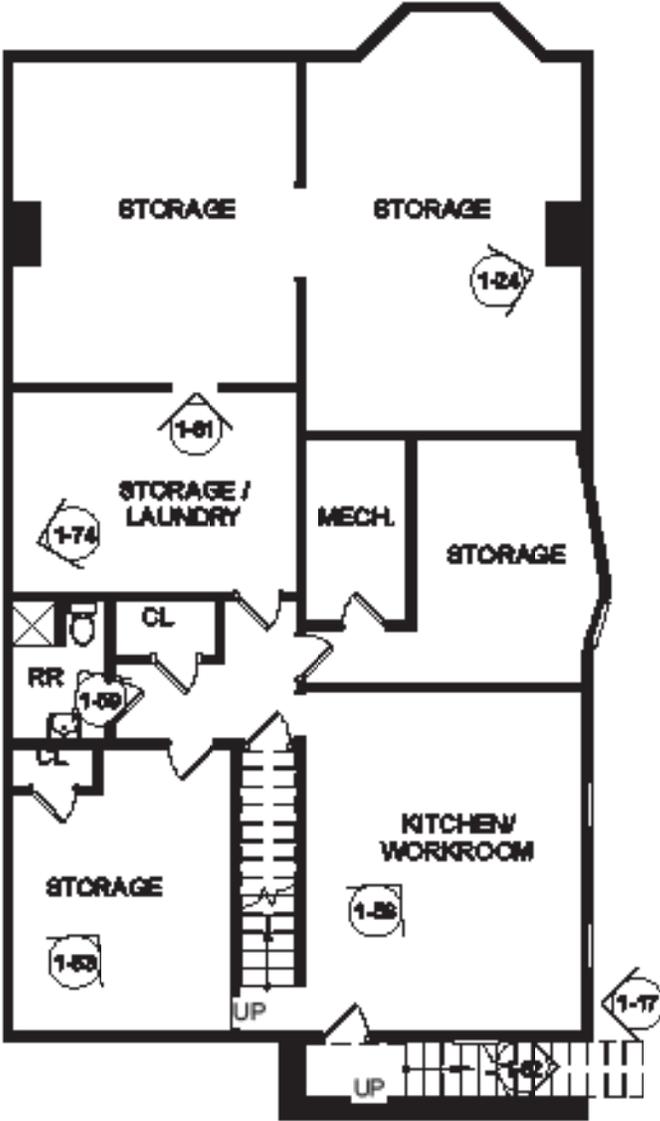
Basement Floor Plan, 2020 (source: Ratio)
